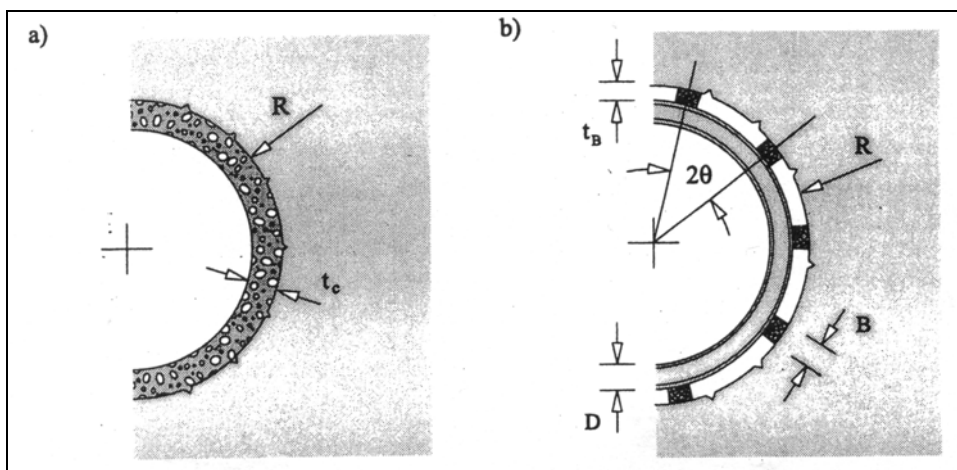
Schematic representations of sections of (a) shotcrete or concrete rings and (b) blocked steel sets (from Brady and Brown, 1985).
